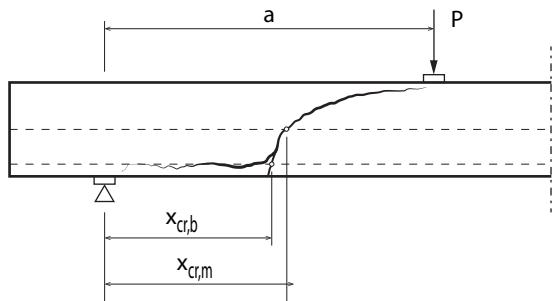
Definition of shear crack location at bottom reinforcement of specimen ( $x_{cr,b}$ ) and centre of the specimen ( $x_{cr,m}$ ).
